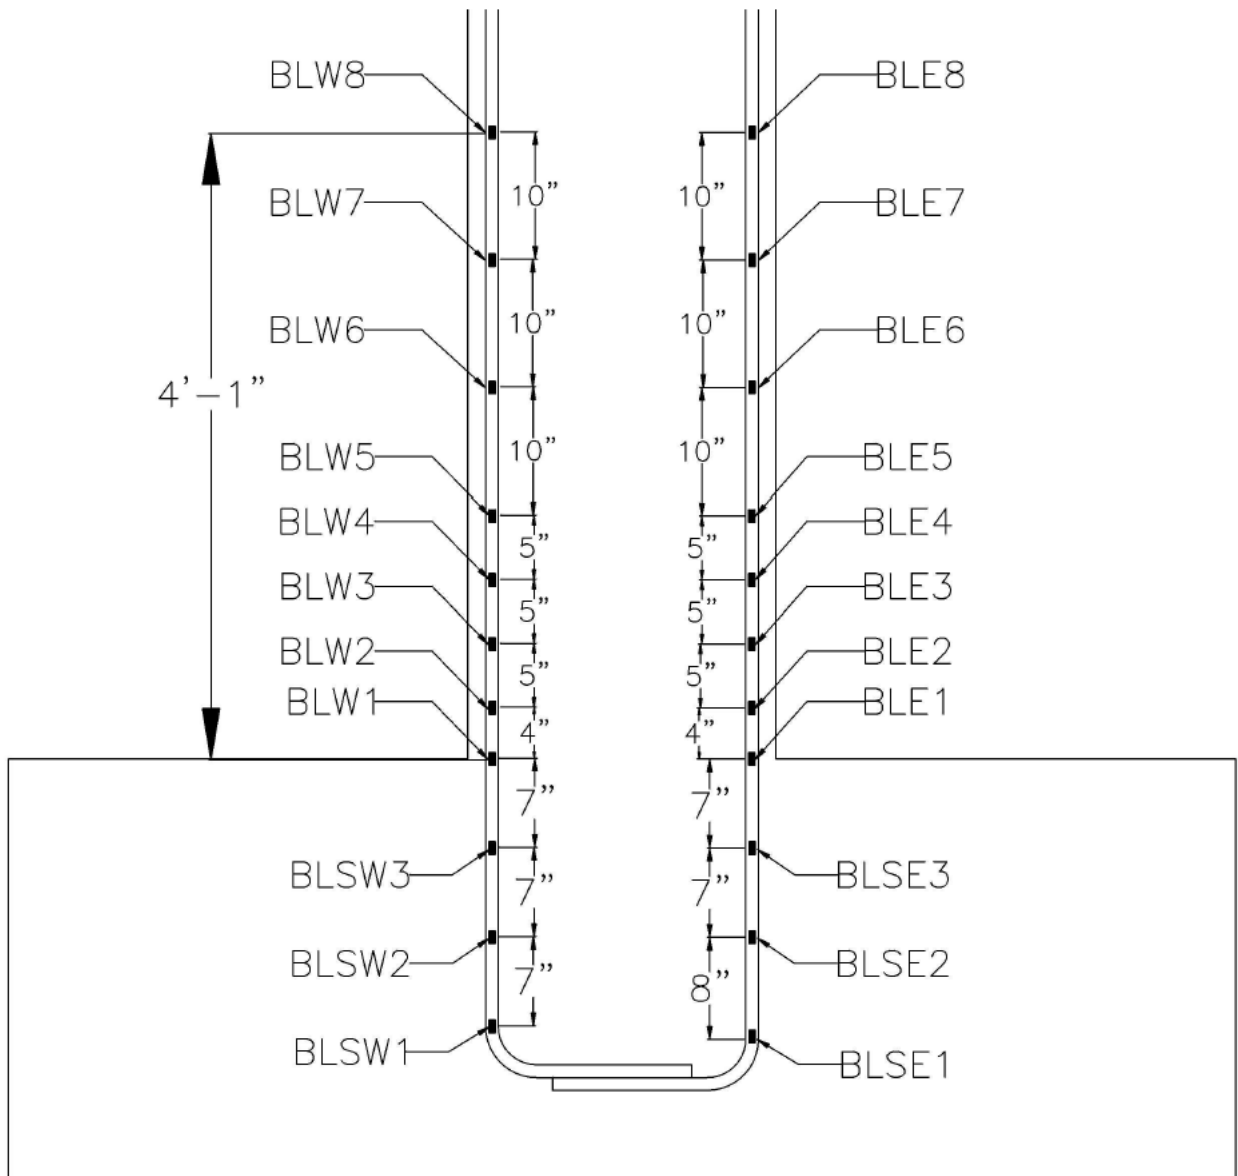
Layout of Strain Gauges on Longitudinal Reinforcement
